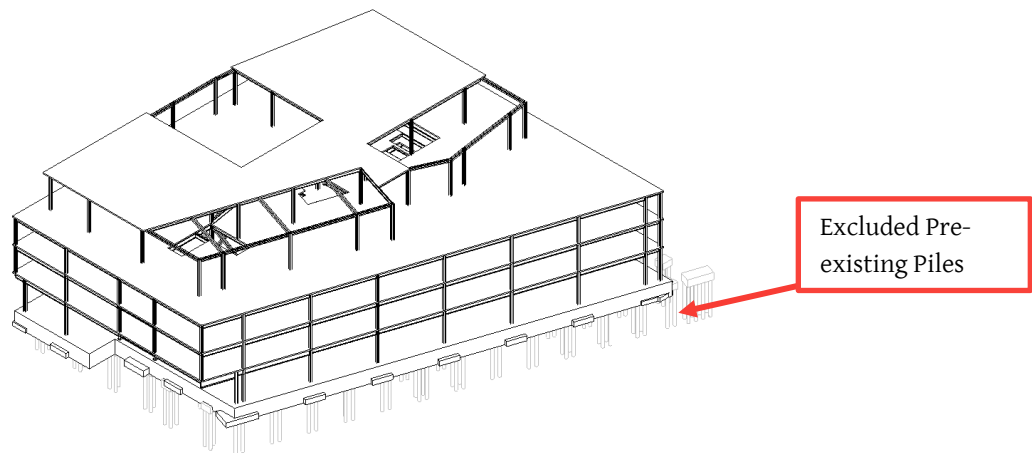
Excluded Elements - Pre-existing Foundation Piles
